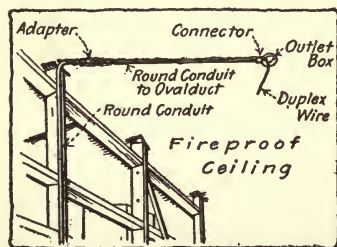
Ovalduct joined to conduit on a fire proof ceiling.
